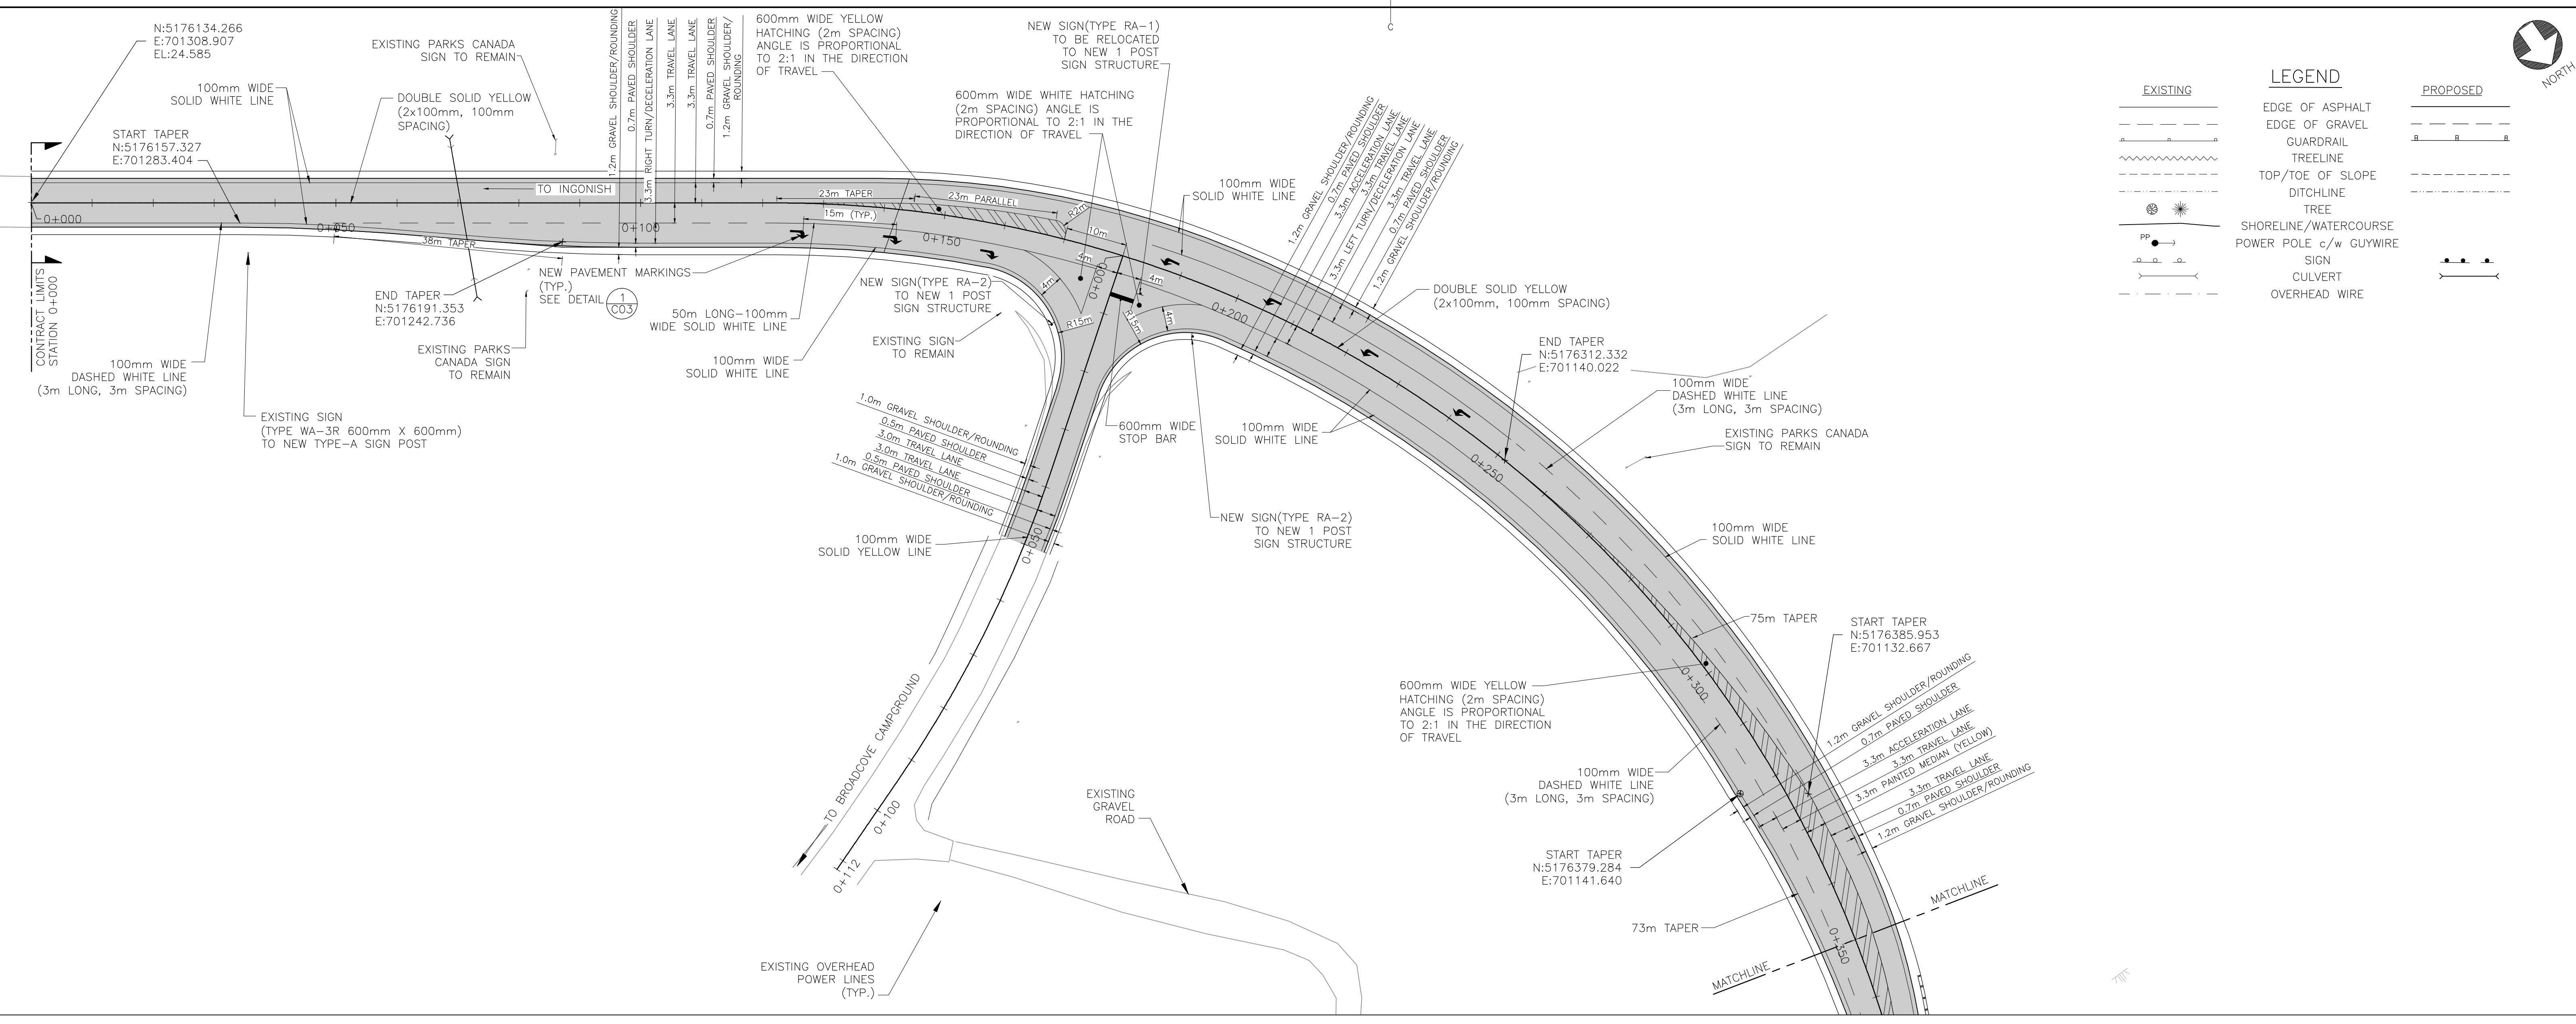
DETAIL - REVISED MINOR COLLECTOR TYPE 'F'
